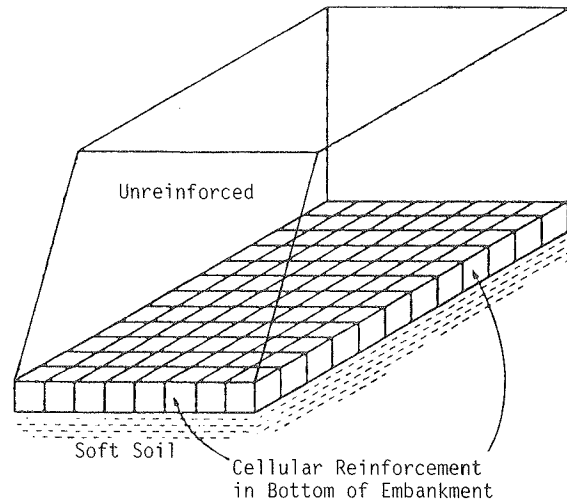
Embankment reinforcement using grid cells. (Source: Ref. 7)
